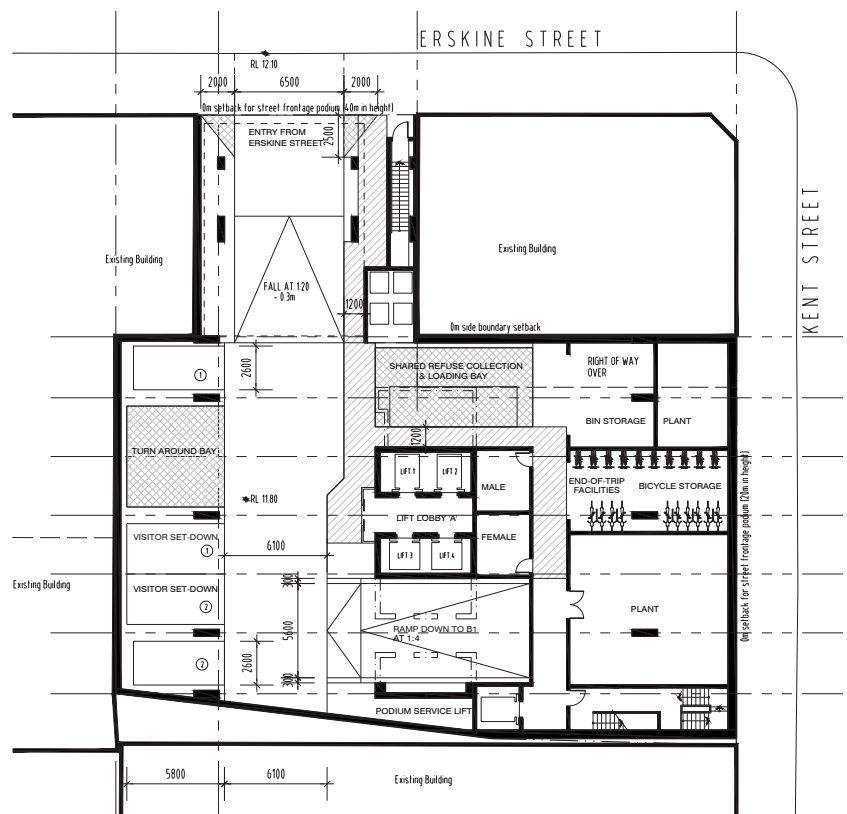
Indicative Lower Ground level plan showing access via Erskine Street.
